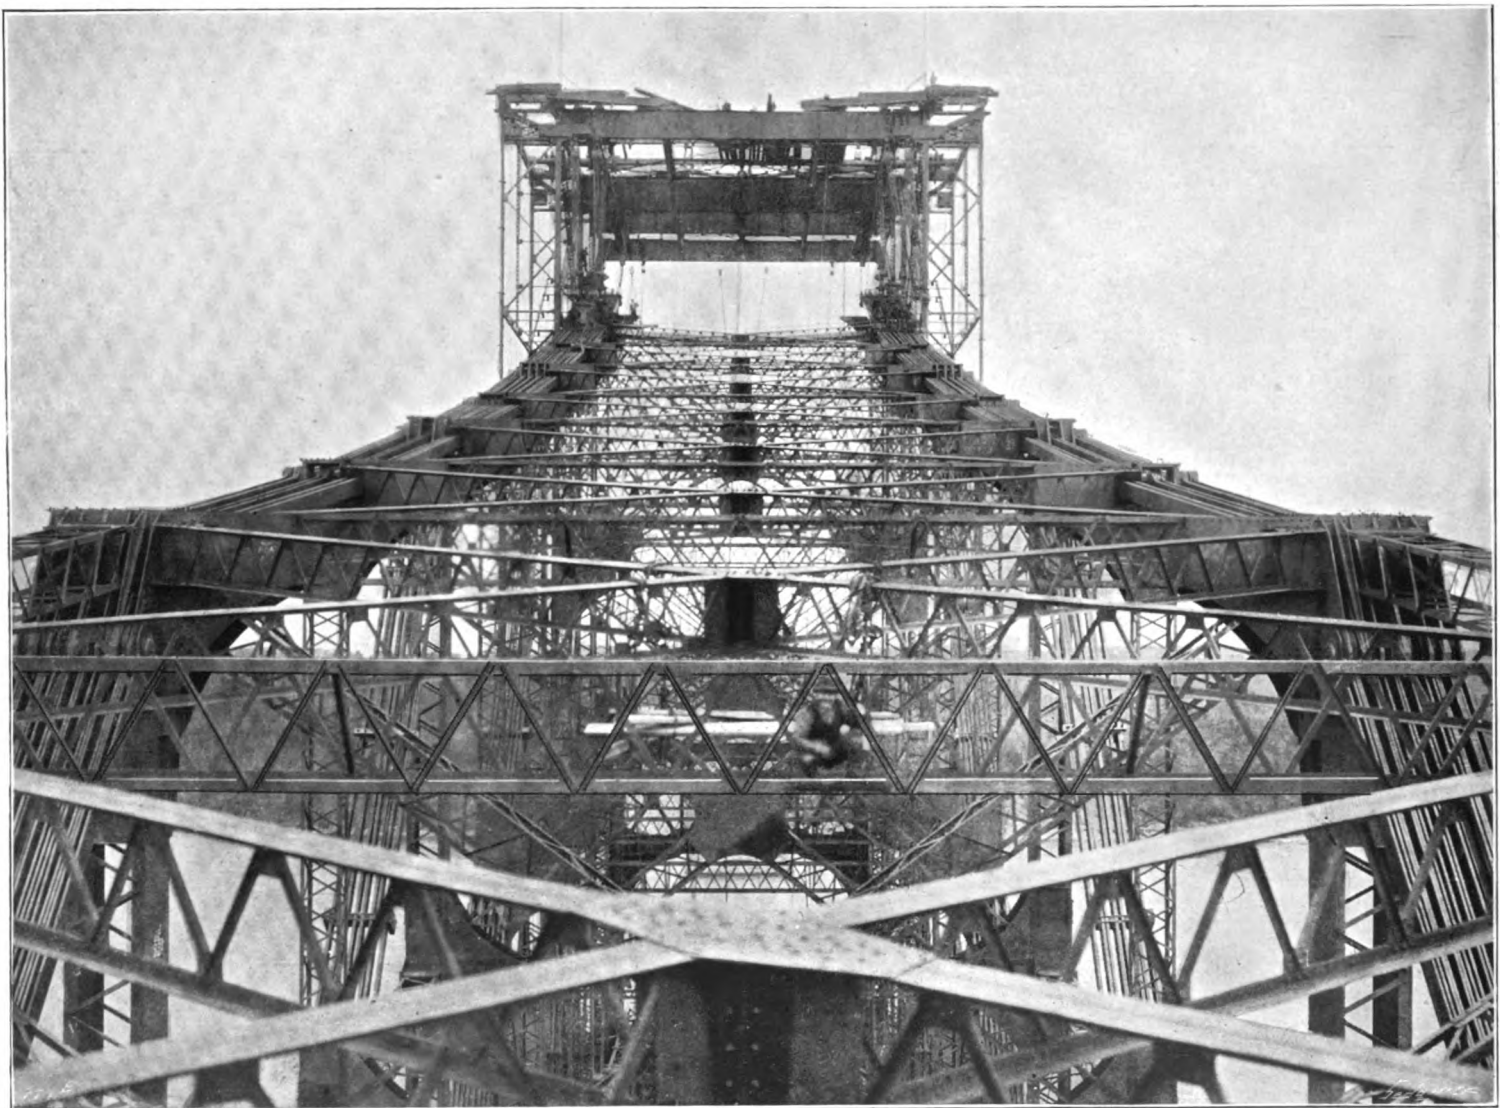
VIEW OF TOP BRACING OF SOUTH ANCHOR-ARM.
